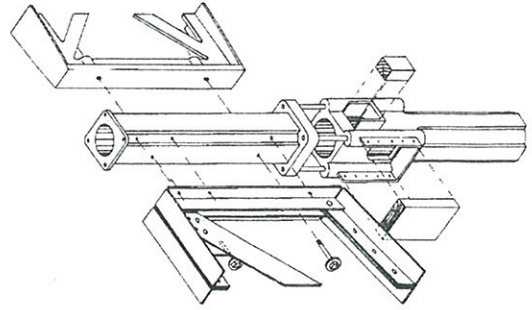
C2b type column with wooden blocking removed showing rainwater inlet to column.
